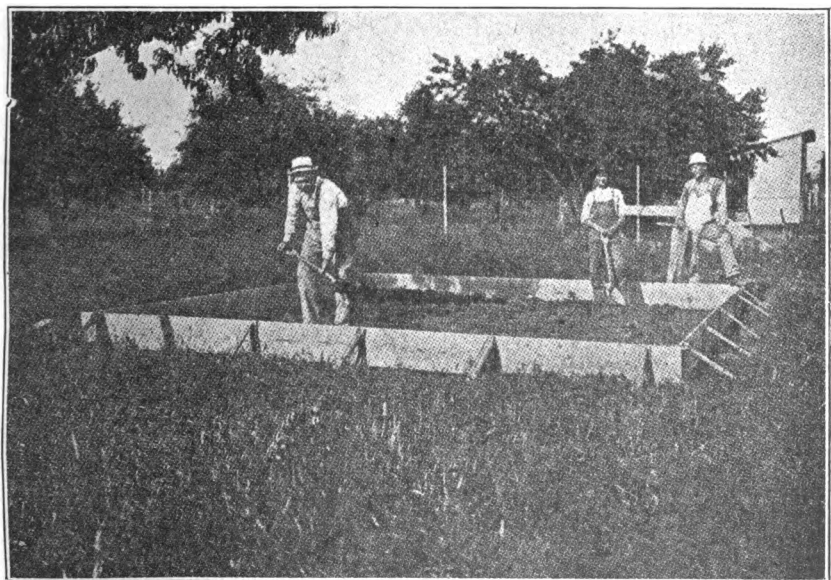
The plan of putting in the forms for concrete foundations and floors. A one-foot board braced with stakes and braces makes a good and simple form for the foundation. Have the top of the boards level and let this be the top of the floor. Dig a trench four inches wide and twelve inches deep on the inside of the form. Fill this with concrete, and this forms the foundation and makes it rat-proof.
